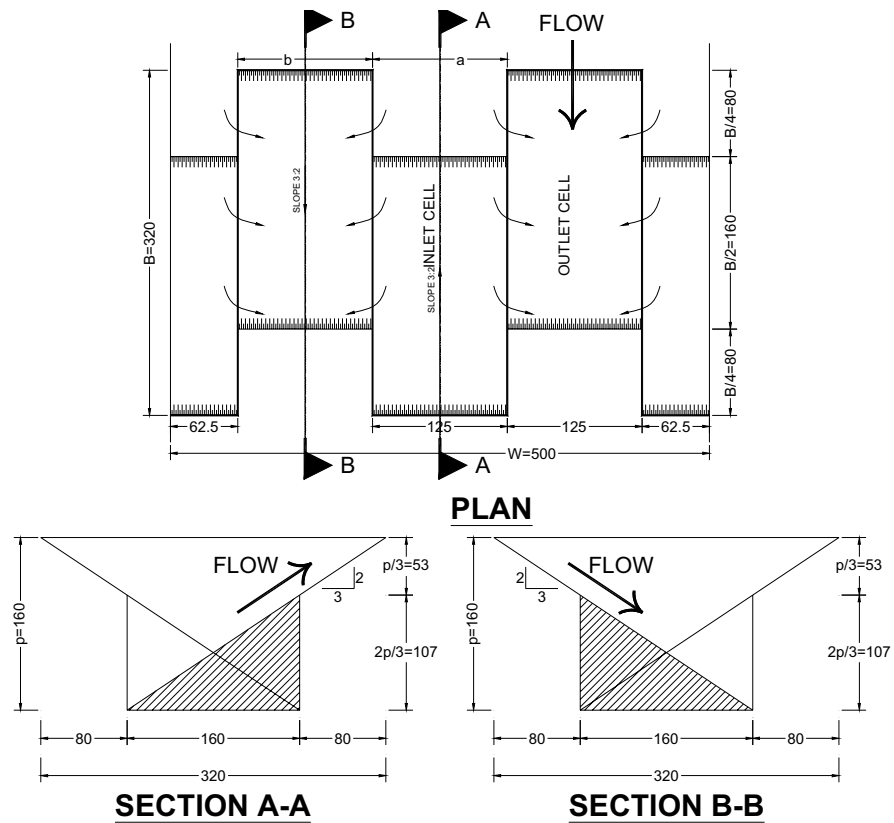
Plan and section of model P₂M₅ (both sides ramping), (dimensions in mm)
